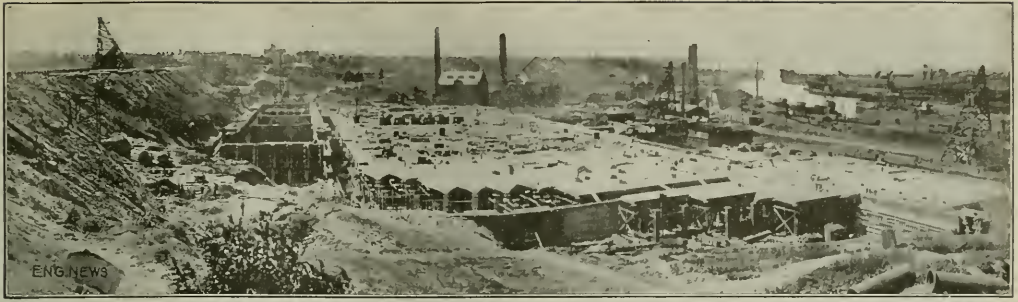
LOOKING SOUTHWESTERLY OVER CONSTRUCTION PLANT AT CLEVELAND FILTRATION PLANT
